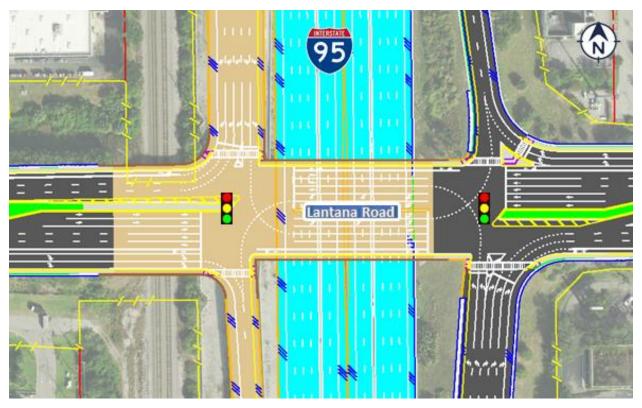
Build Alternative 1: Bridge Over SFRC Railroad and SR 9/I-95 - Plan View
